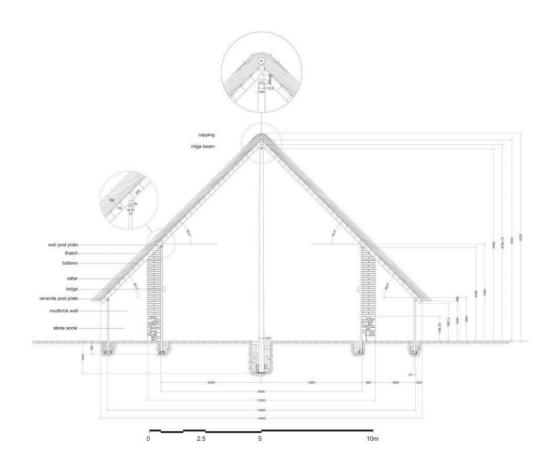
IDEALISED RECONSTRUCTION OF A CROSS-SECTION OF THE BUILDING IN THE AREA EAST OF B-B', WITH 'PROP-AND-RIDGEPOLE' OR 'COLUMN-AND-RIDGEPOLE' ROOF CONSTRUCTION. THE DETAILS OF THE WALLS AND POST PITS ARE HYPOTHETICAL.
